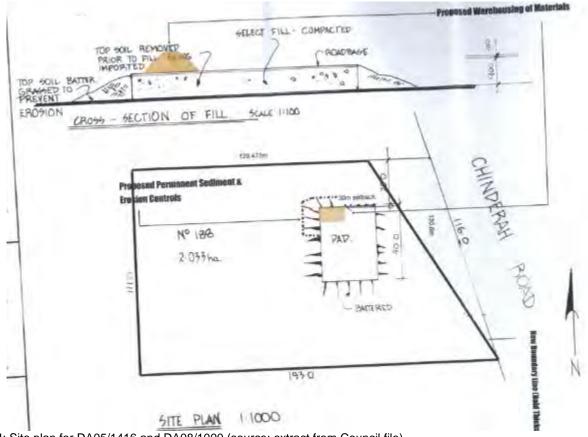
Site plan for DA05/1416 and DA08/1000 (source: extract from Council file)
